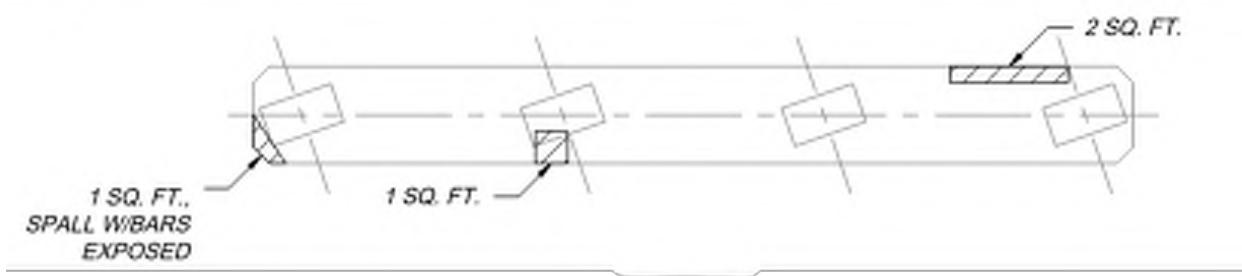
Location of Proposed Concrete Repairs - Pier 3 Plan View MP 182.1
